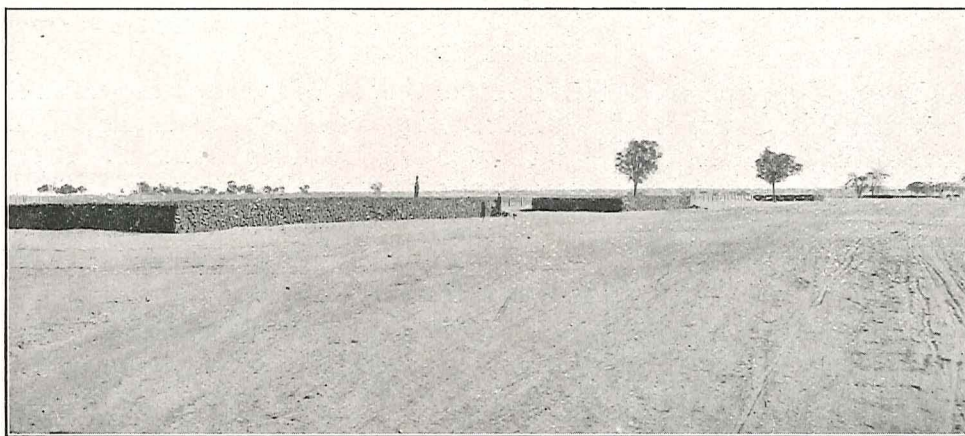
Showing huge heaps of ironstone for construction of Nhill-Kaniva Road, Shire of Lowan.
